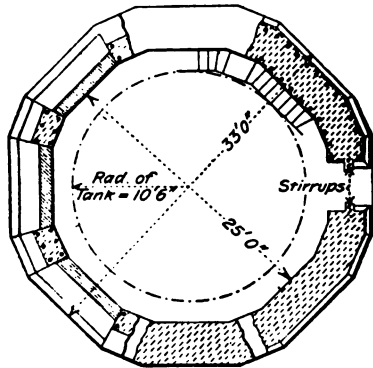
Horizontal Section of Base of Fort Revere Water Tower.
